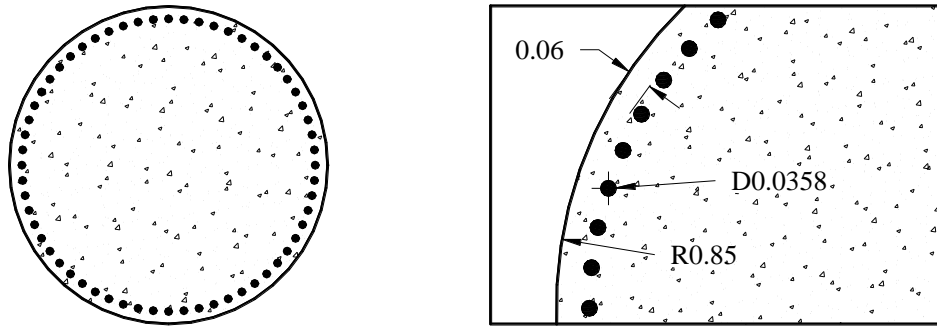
Cross-section of a pier of Bridge C with the 60 reinforcing bars. Units in meters.
